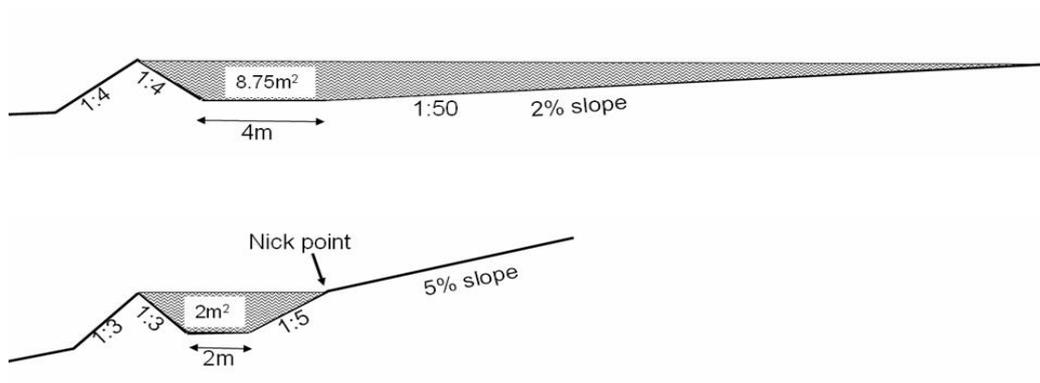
Contour bank cross sections for banks 0.5m high on a 2% and a 5% slope.
